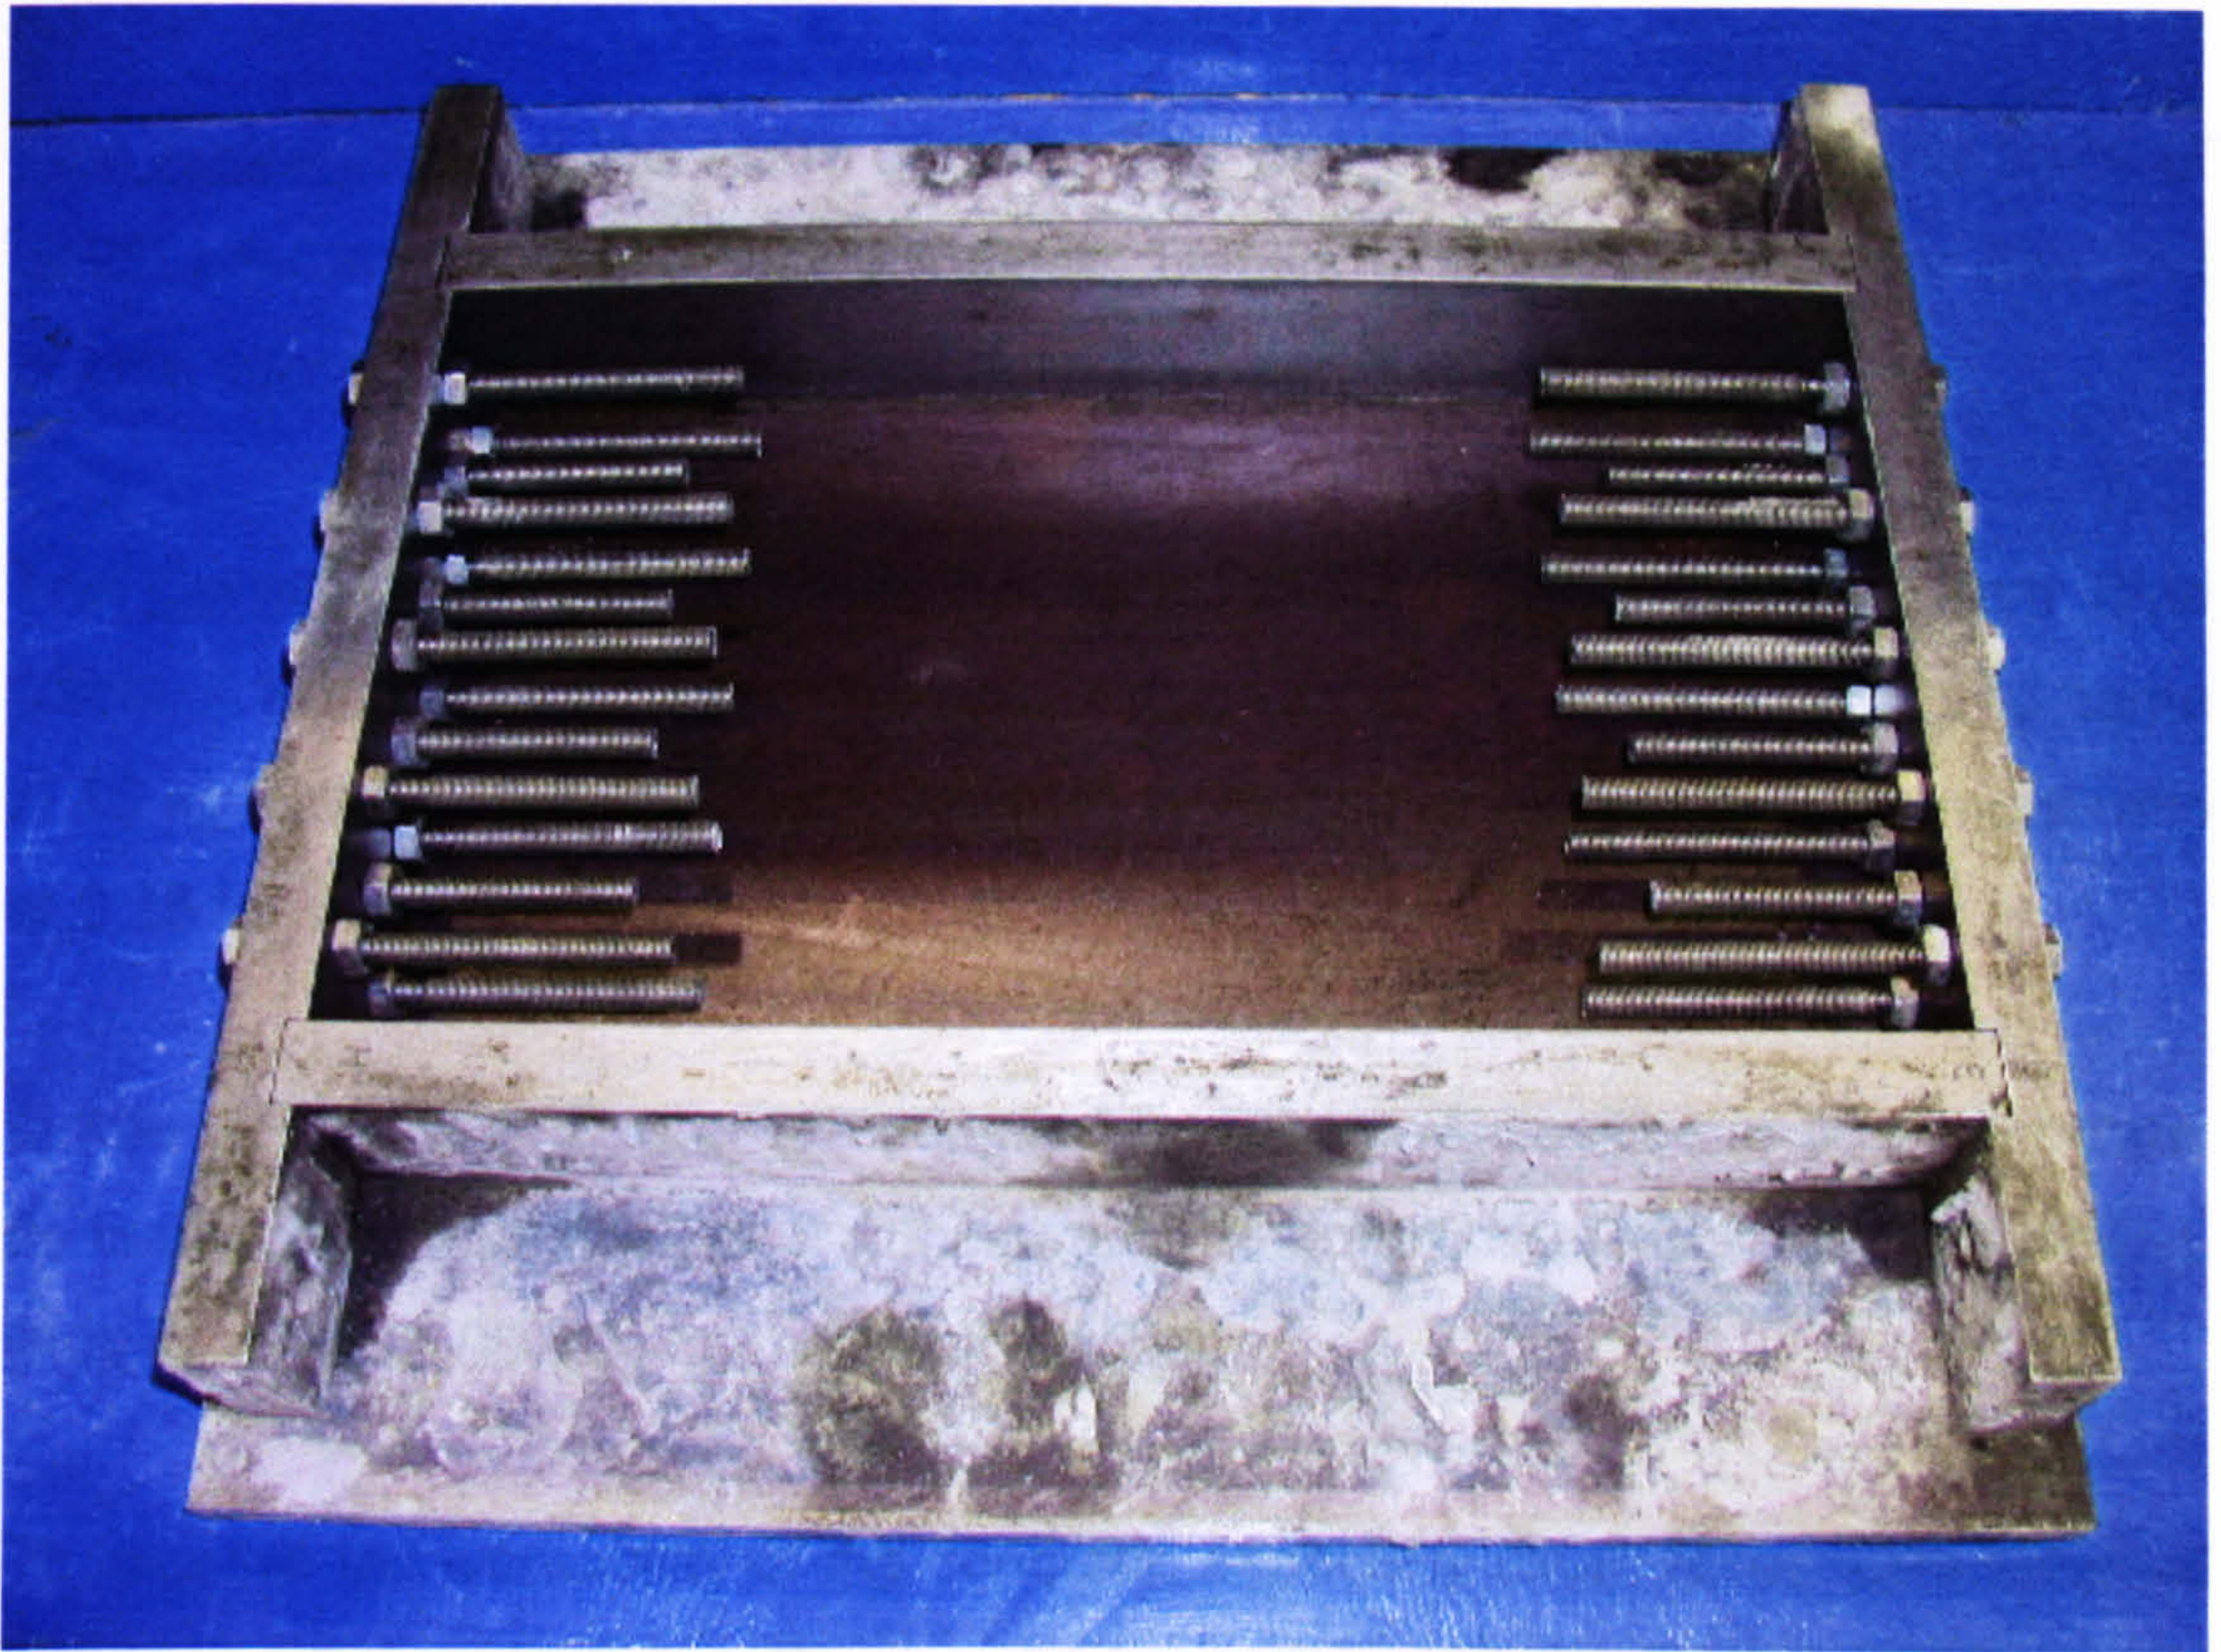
Compression-tension mould with threaded rods ready for casting
